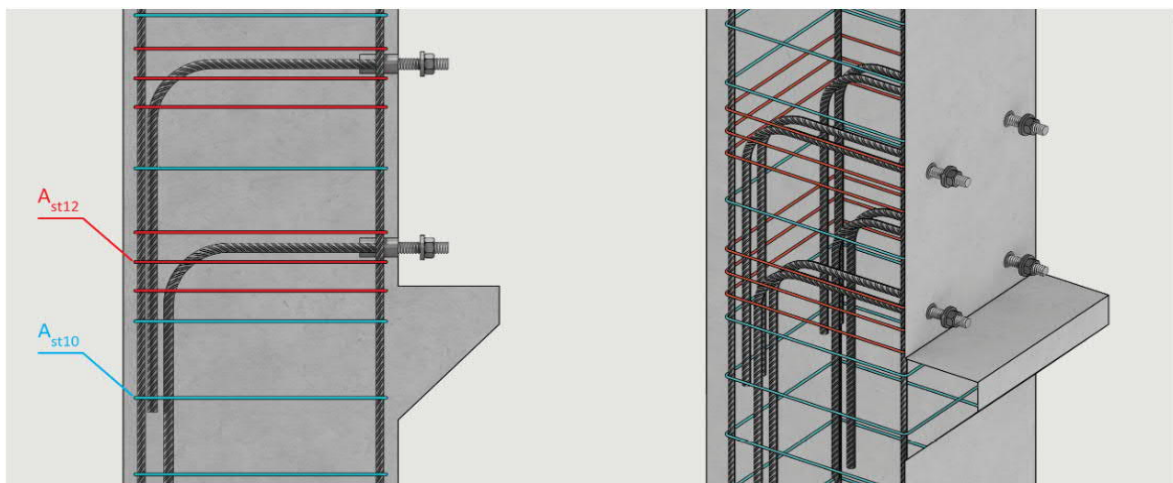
Placement of a bent anchoring bolt and reinforcement in the column
